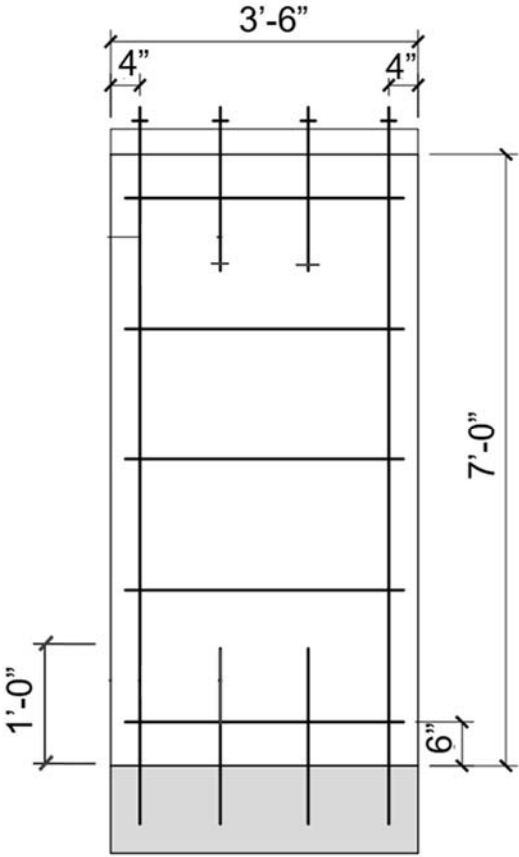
Wall 2 Reinforcement System (Heavy Reinforcement).
